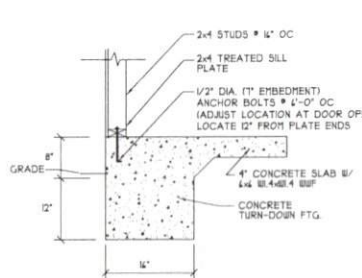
ALTERNATE BRACED WALL PANEL
